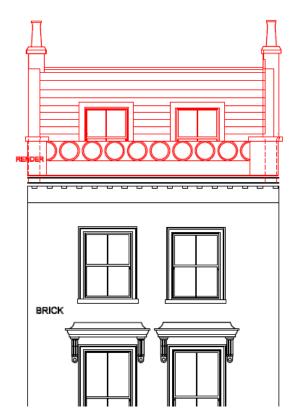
Fig. C Proposed Mansard extension and parapet roundel detail to front elevation
